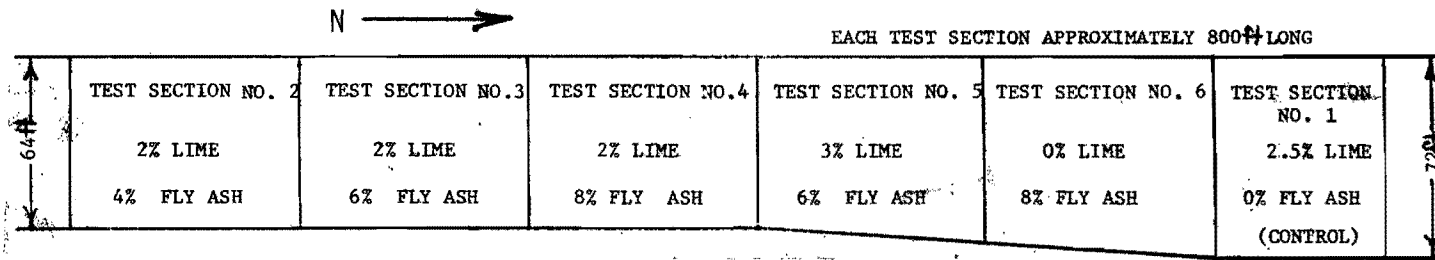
Layout Planview of Test Sections on SH 335 in Potter County, Texas (Site No. 8)
